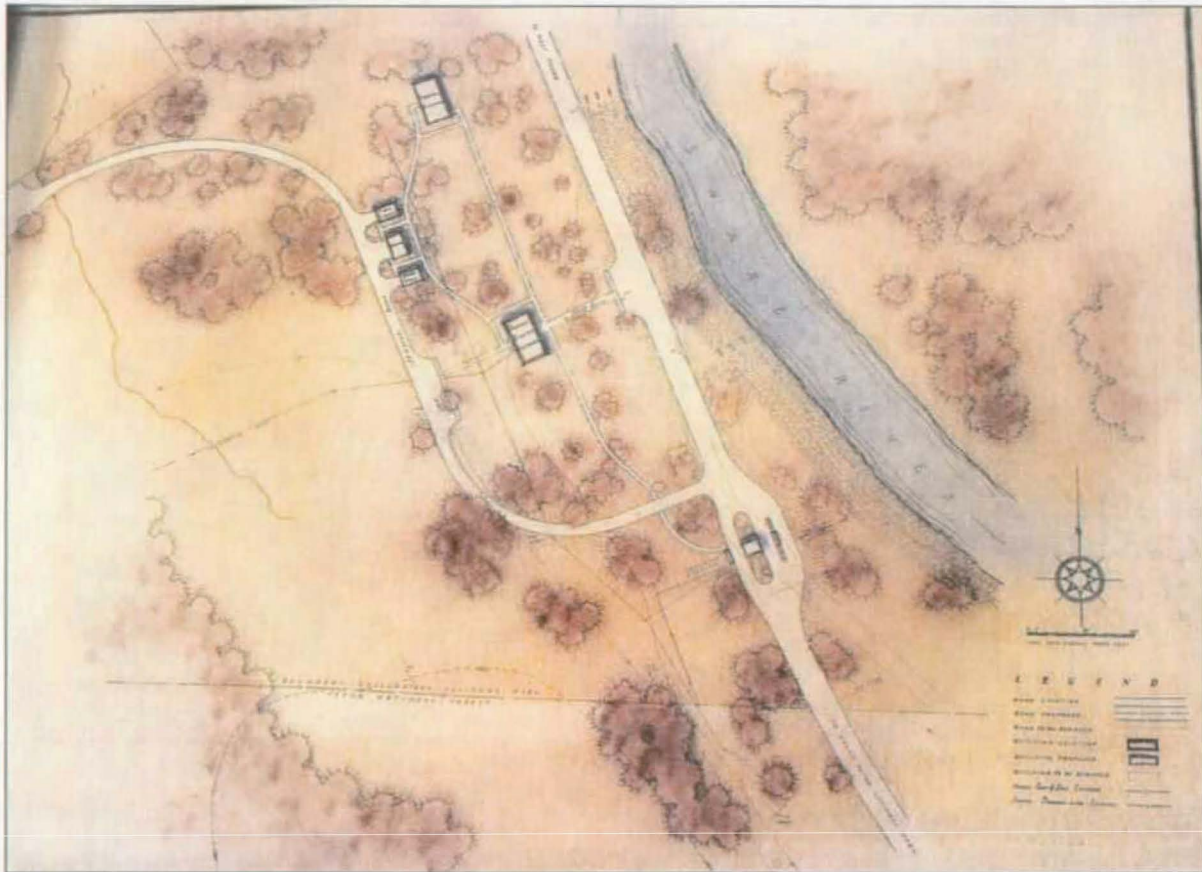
; Photo Image of 1941 Master Plan of South Entrance
